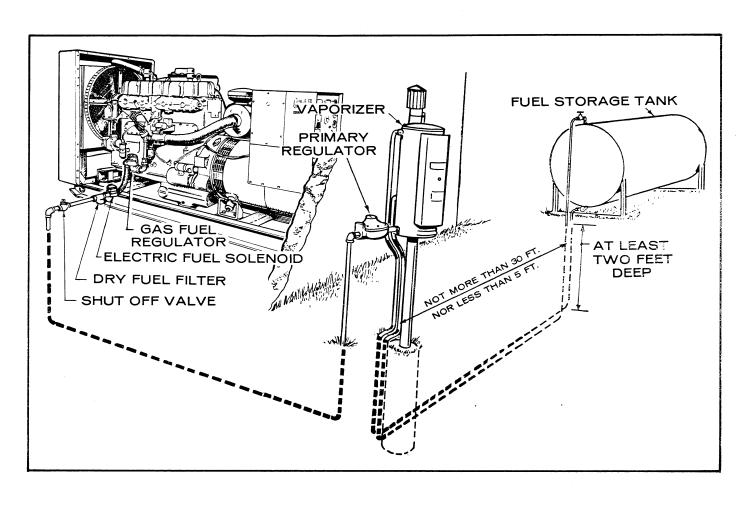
TYPICAL INSTALLATION OF LPG WITHDRAWAL SYSTEM
